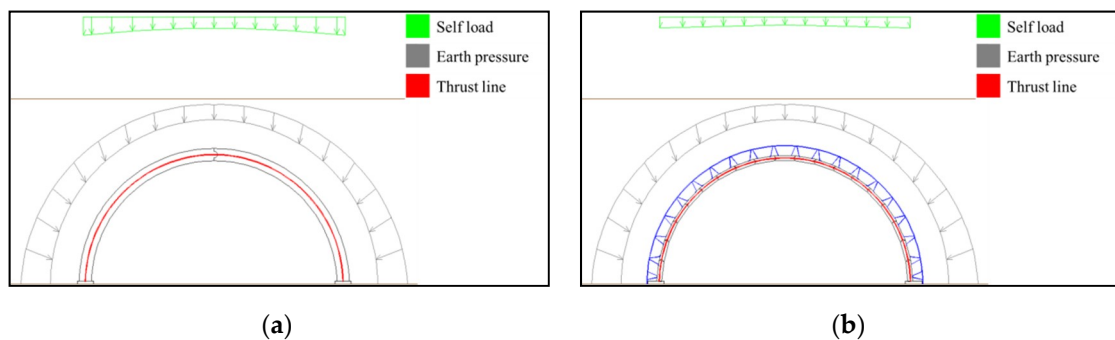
Thrust line of arch bridge with self-weight and earth pressure (after construction): (a) a precast, three-hinged concrete arch and (b) a precast outrigger panel arch.
